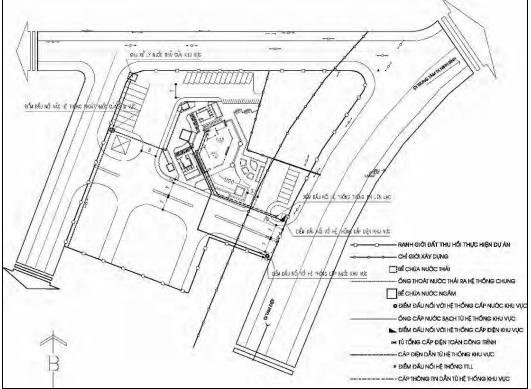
Site Layout Plan of Michinoeki Pilot Project in Ninh Binh Province Source: JICA Study Team
